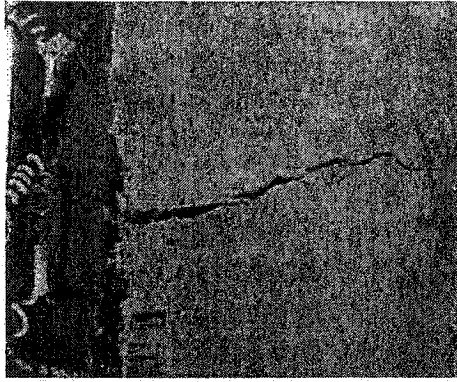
Side view of a pull-apart specimen showing crack opening
